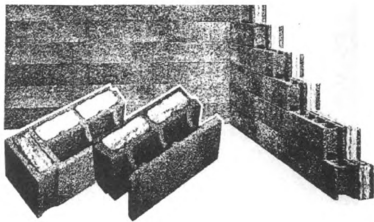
WCP Block for building walls (Hoene, 1997)
